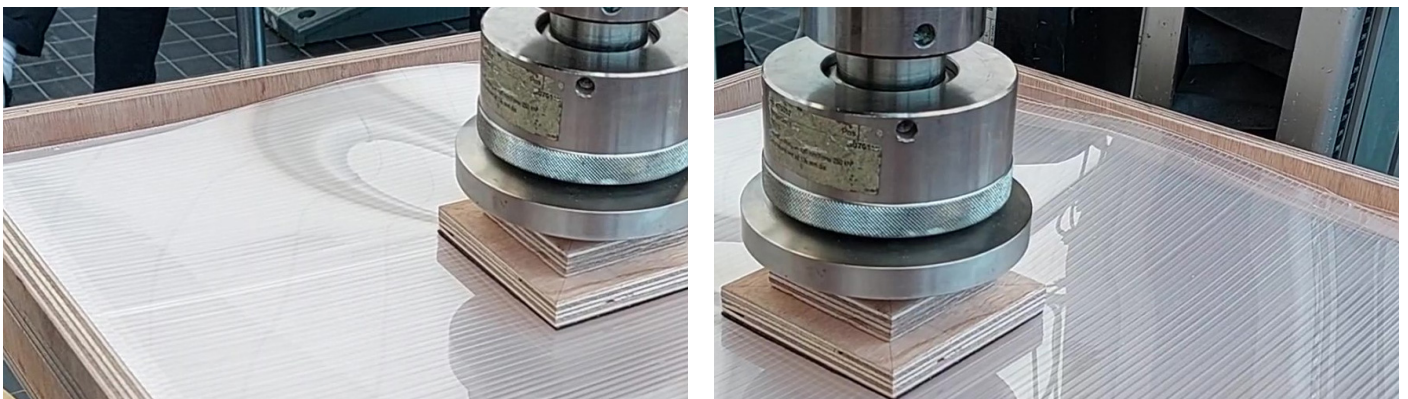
Specimen 3; a) delamination of glass, b) deformation on the centre of the edge (Author)
